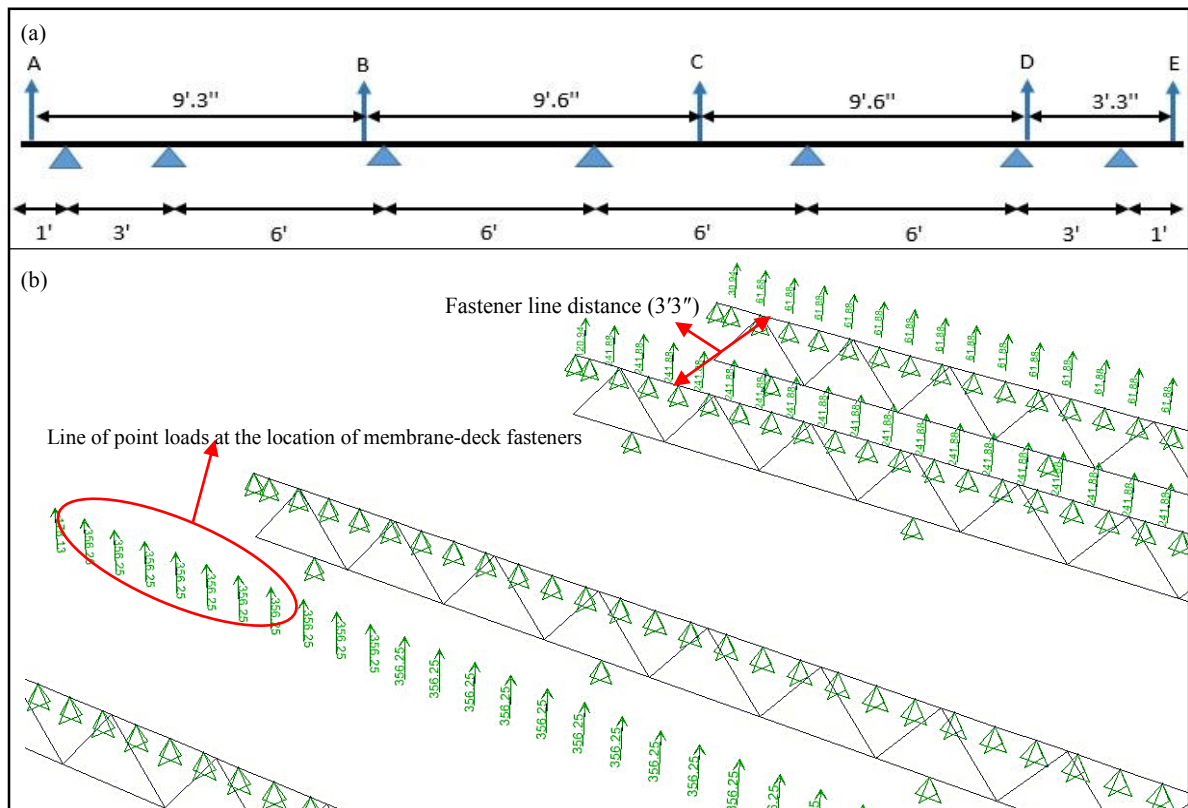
a) Point loading scheme for 9'6" fasteners' line distance, b) Applying point load in SAP2000
